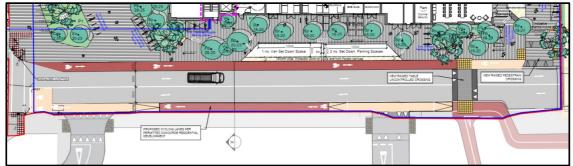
Upgrades Proposed to the Western Access Road of the Subject Site
